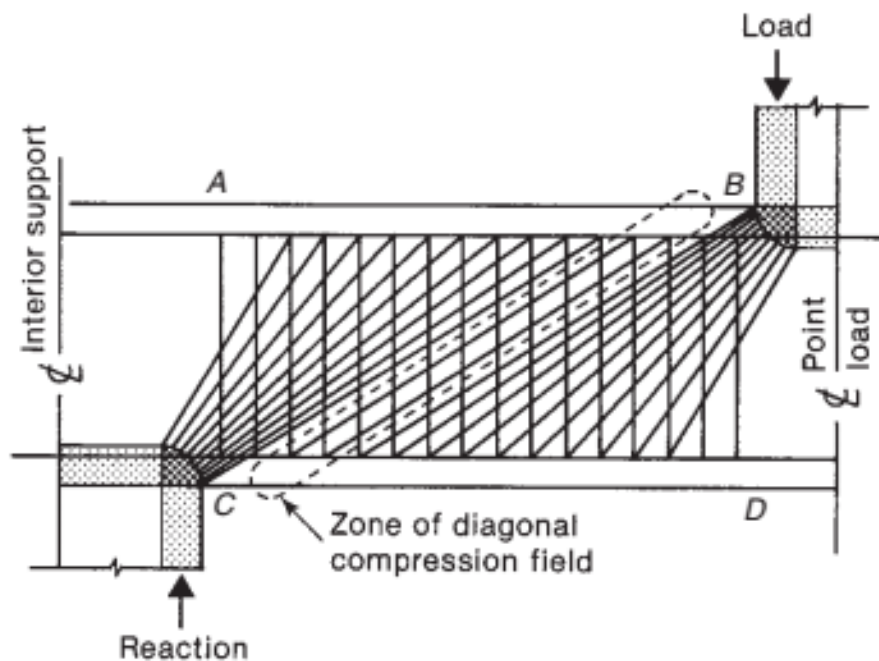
Crack patterns and truss model for two span beams (James K. Wight and Macgregor 2012).
